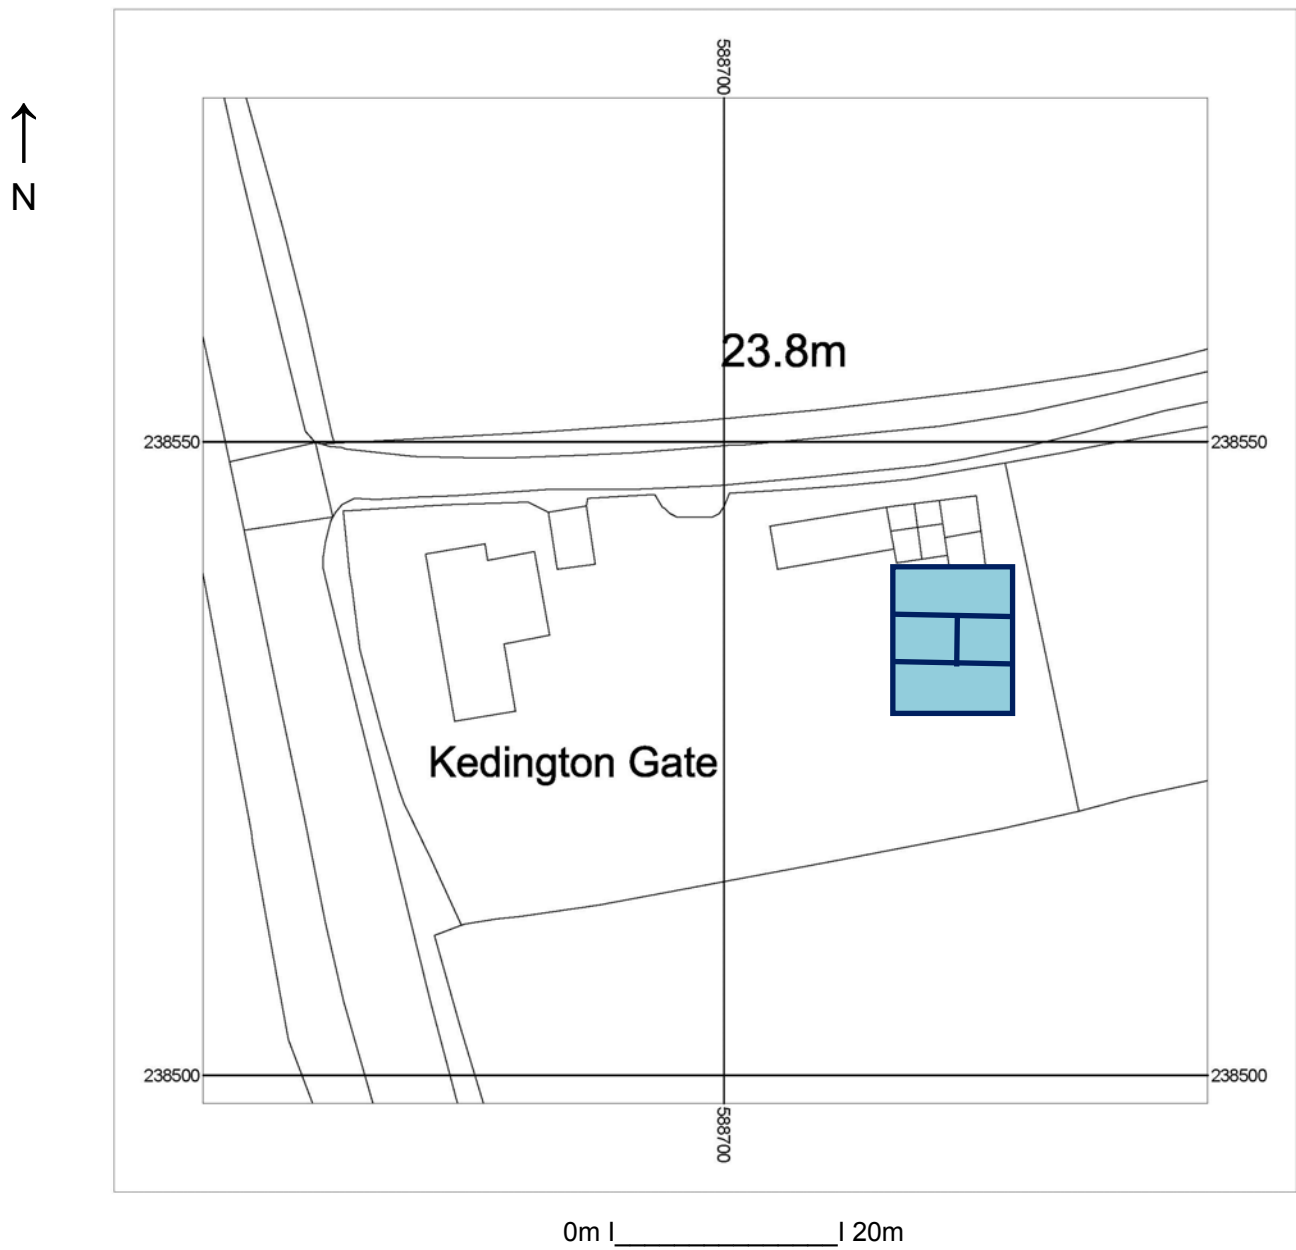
Monitored new dwelling area (dark blue- foundation trenches)
